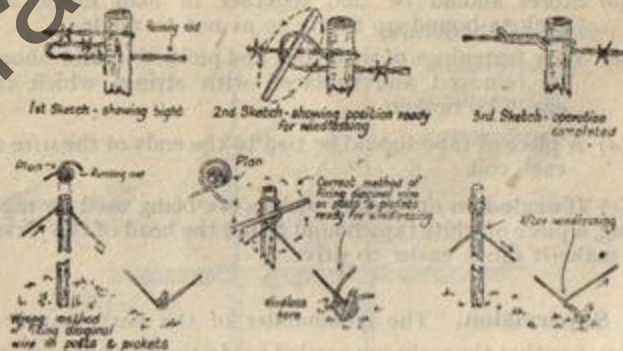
METHOD OF FIXING WIRE ON POSTS
